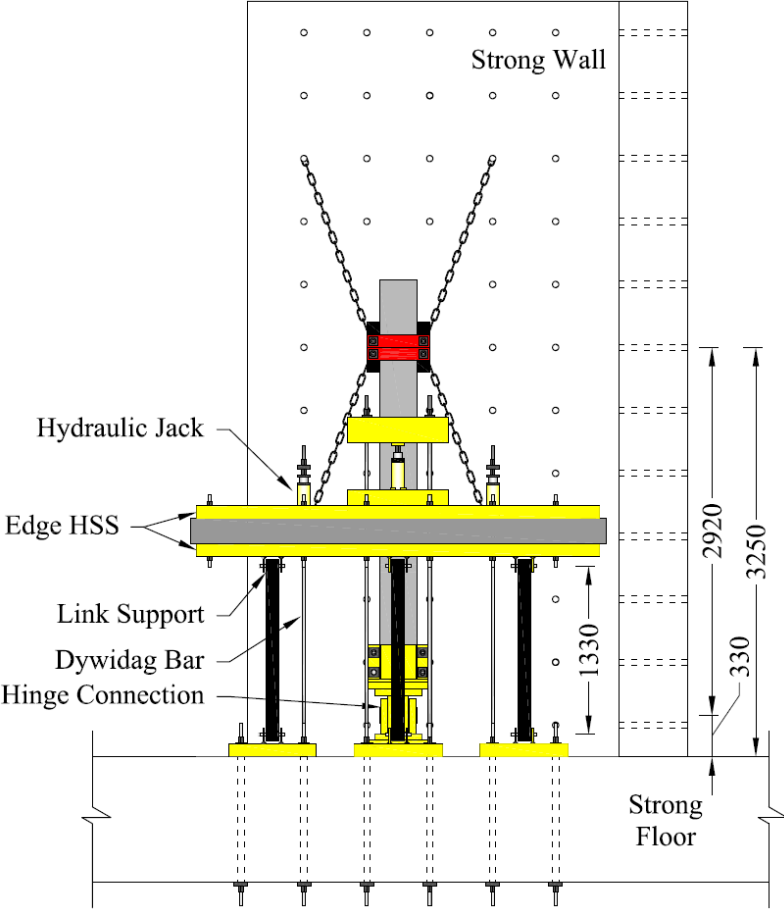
Schematic drawing of the test setup – side view (dimensions in mm)
